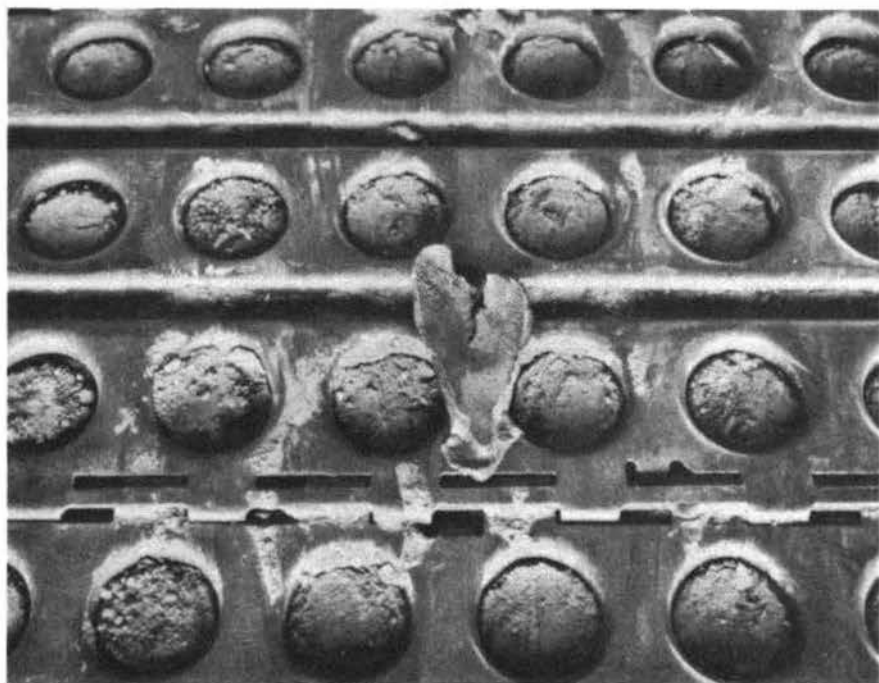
Large piece of rubber torn from tire during braking test on M6 mat -- bedded
